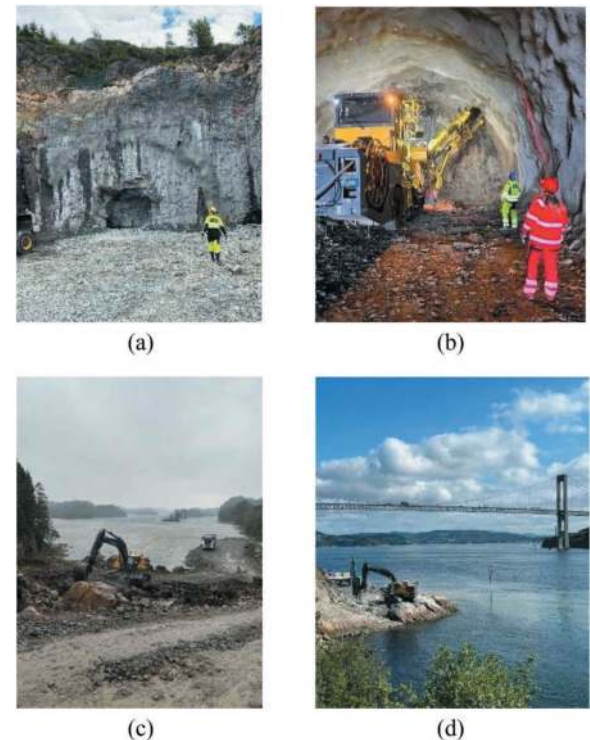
(a) View of Westbound West portal and (b) drill & blast excavation of the Kolltveit tunnel. (c) Filling works of the Storavatnet lake. (d) View from the Knarrvika side of the realization of the foundation of new Sotra bridge.
